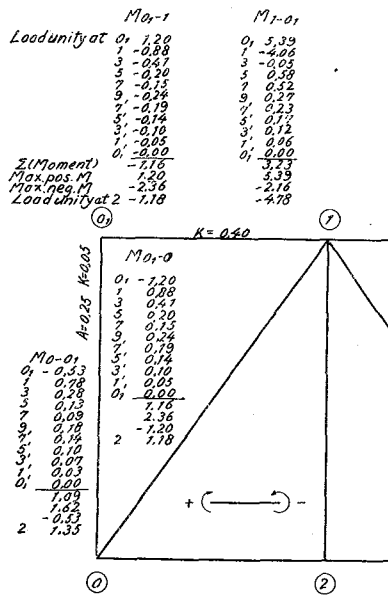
Joint Moment in Deck Pratt Truss with 10 Panels
